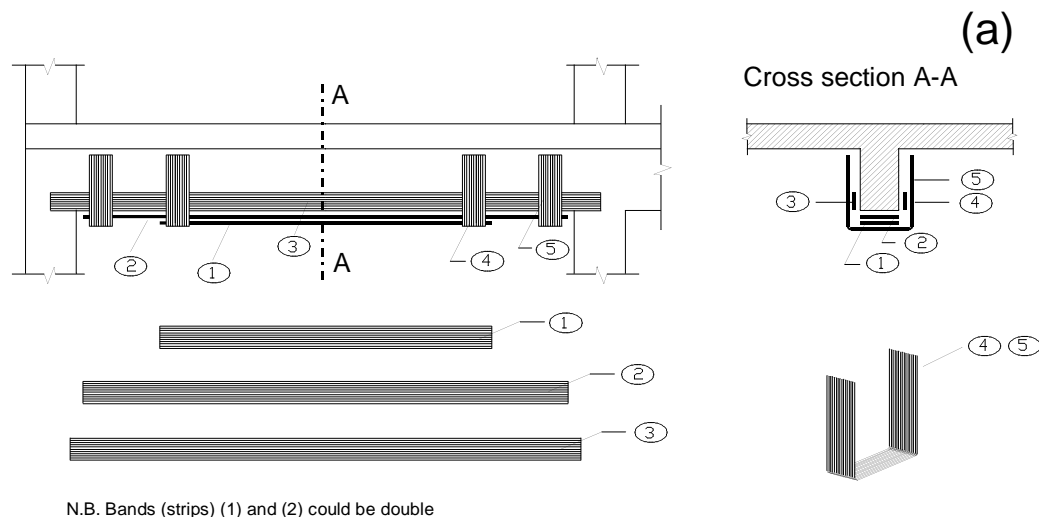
Flexural reinforcement with possible shear anchorages (*fib Bulletin 14*)
